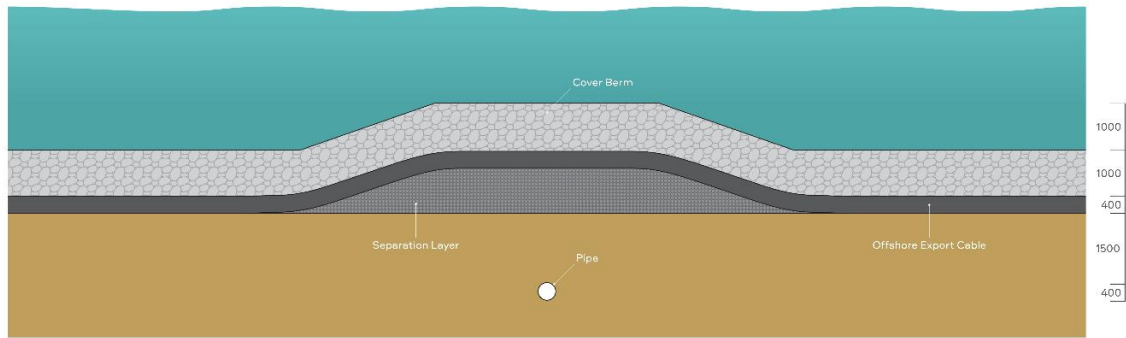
Cross Sectional View of Proposed Crossing Layout
